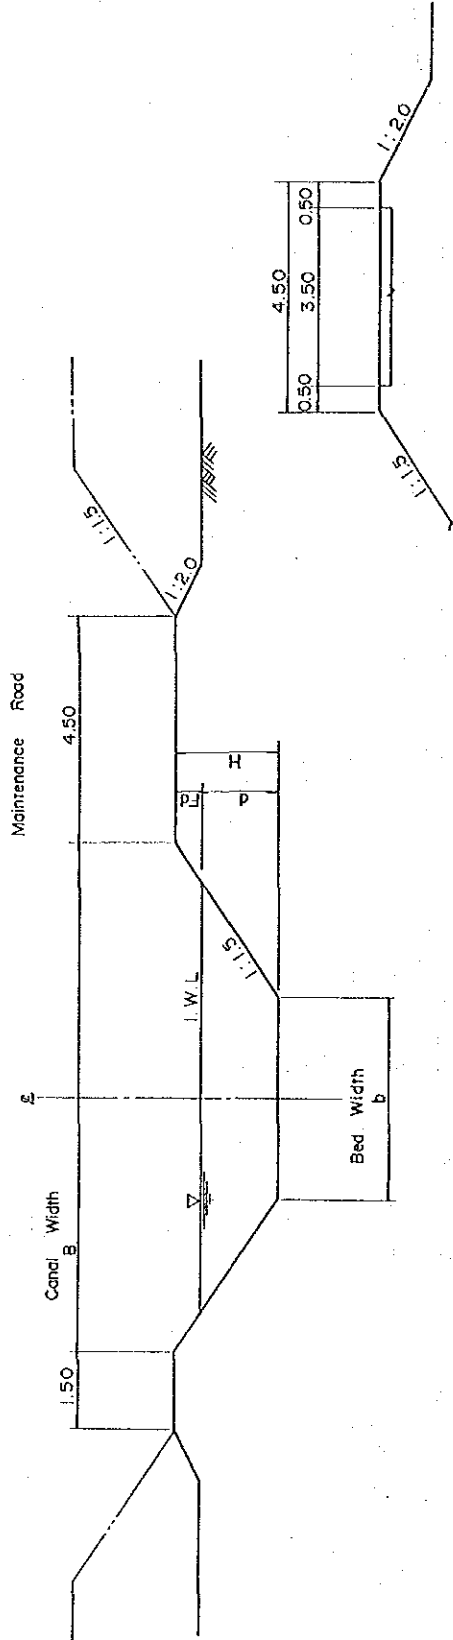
TYPICAL CROSS SECTION OF MAIN IRRIGATION CANAL
